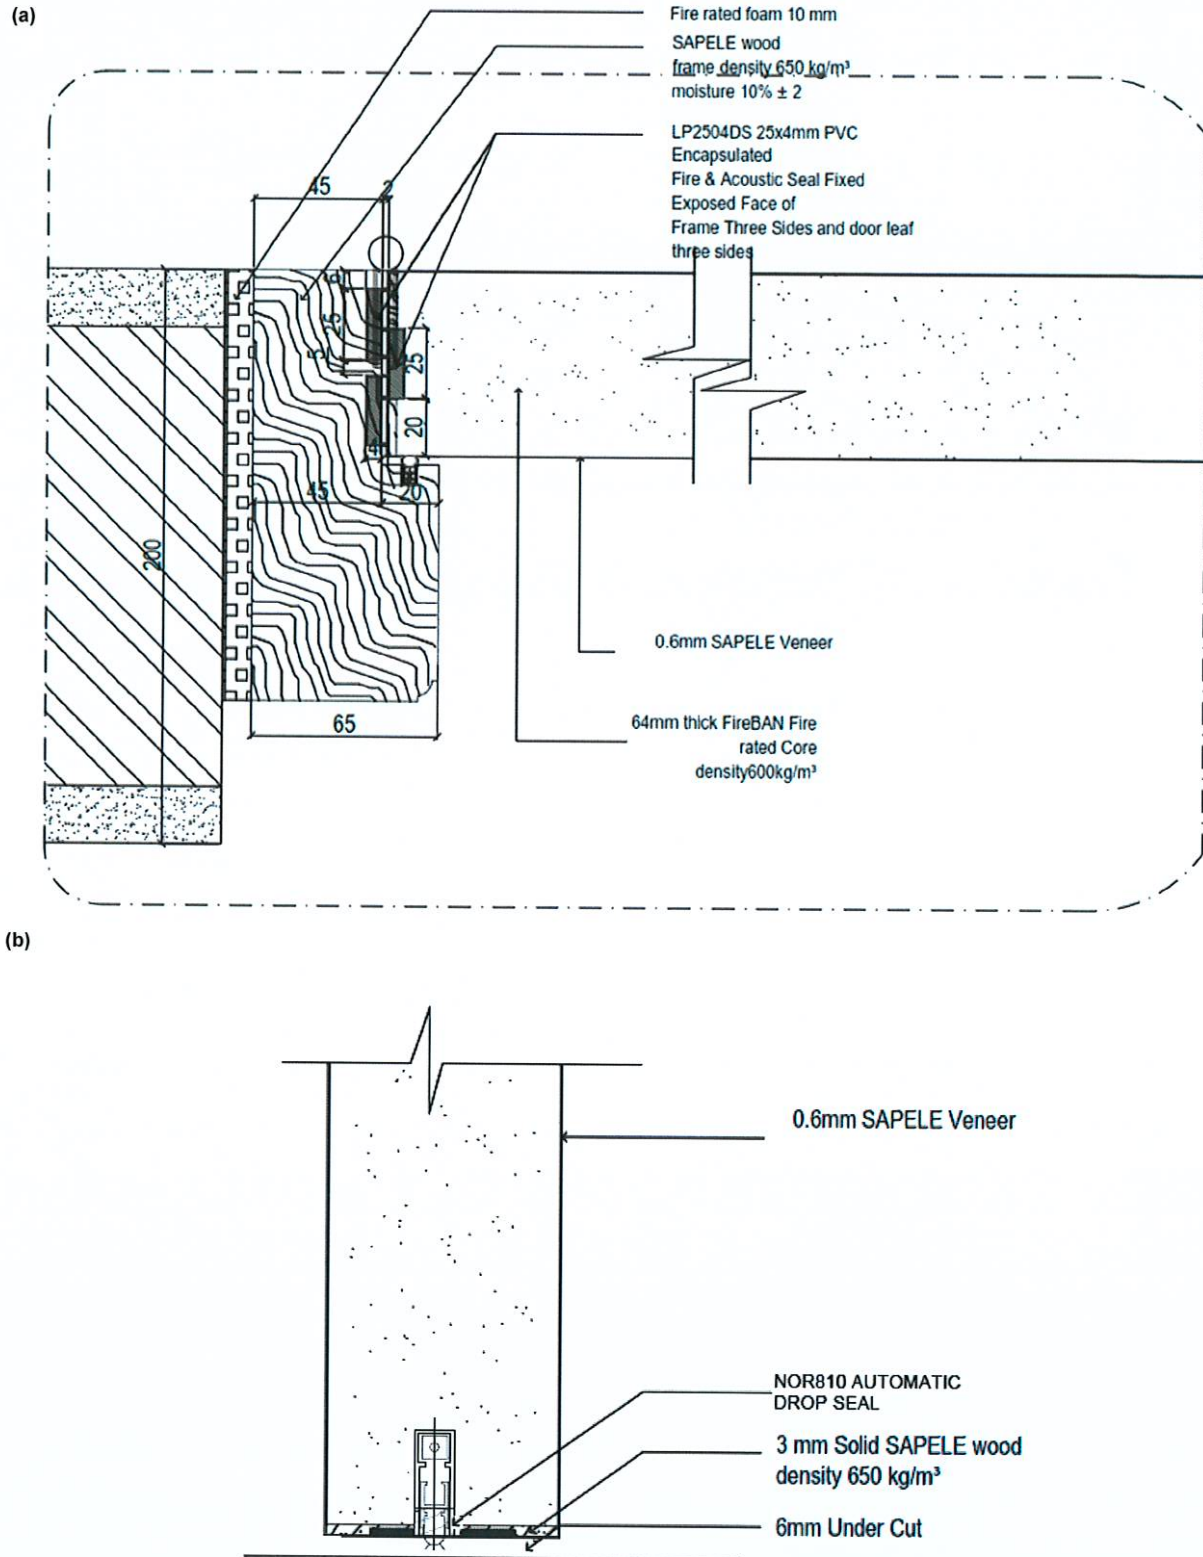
(a) Top view of hinge side fixing details of FD90 door frame and leaf (b) Side view of bottom section FD90 door leaf
